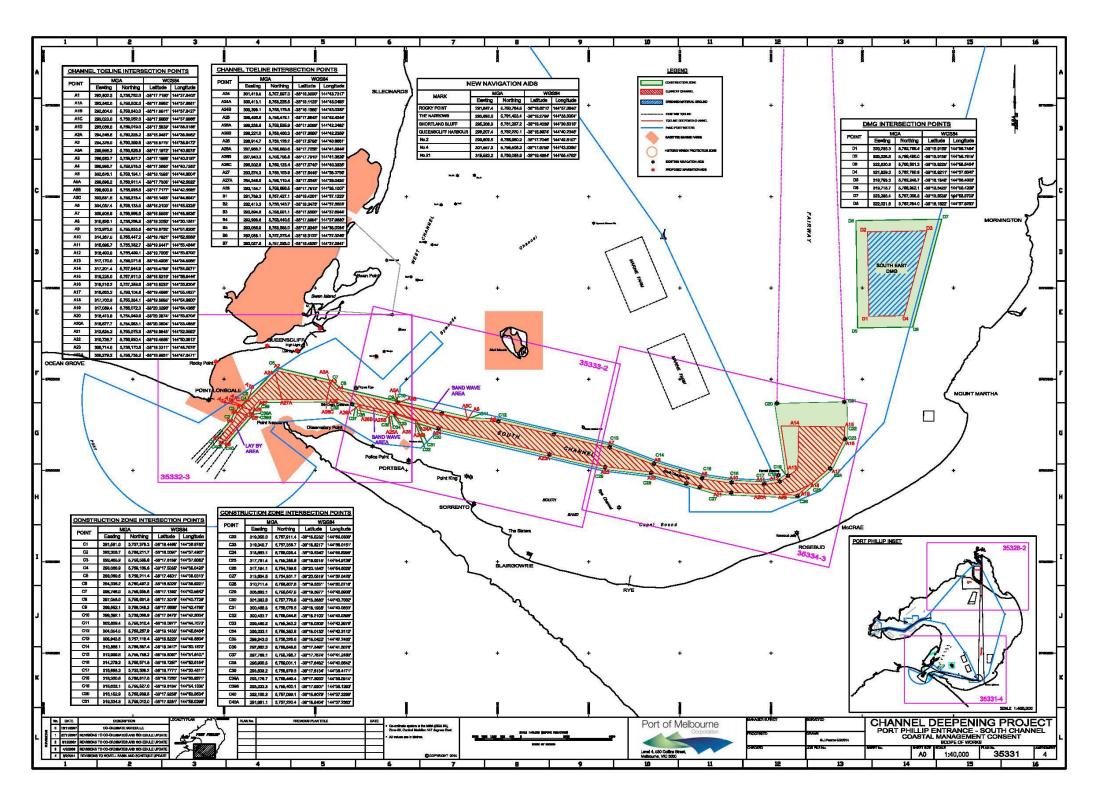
Activity Zone Definition South Channel Plan Layout (Dwg 35331-4)
